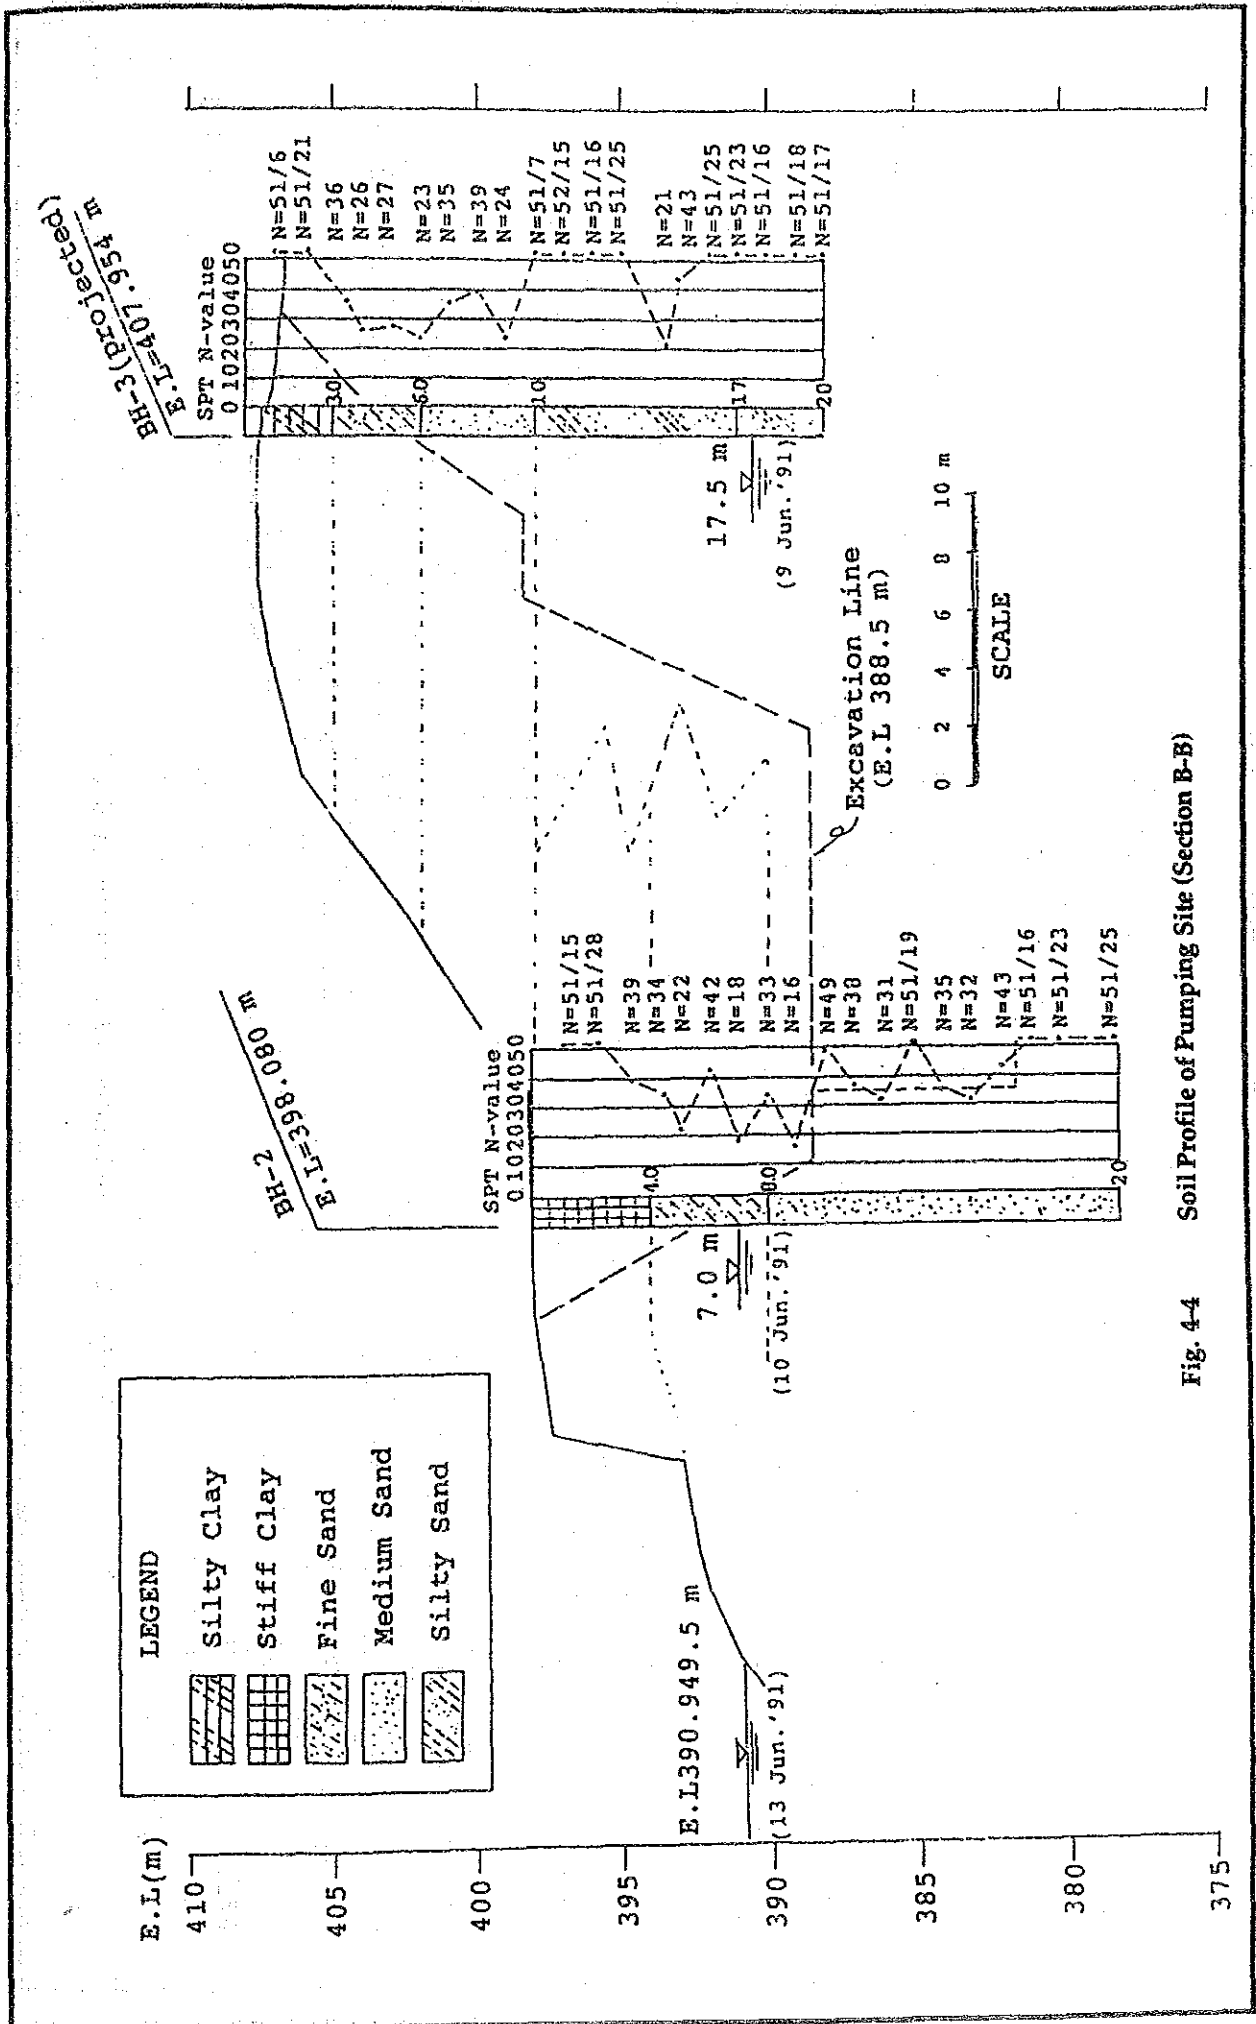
Soil Profile of Pumping Site (Section B-B)
